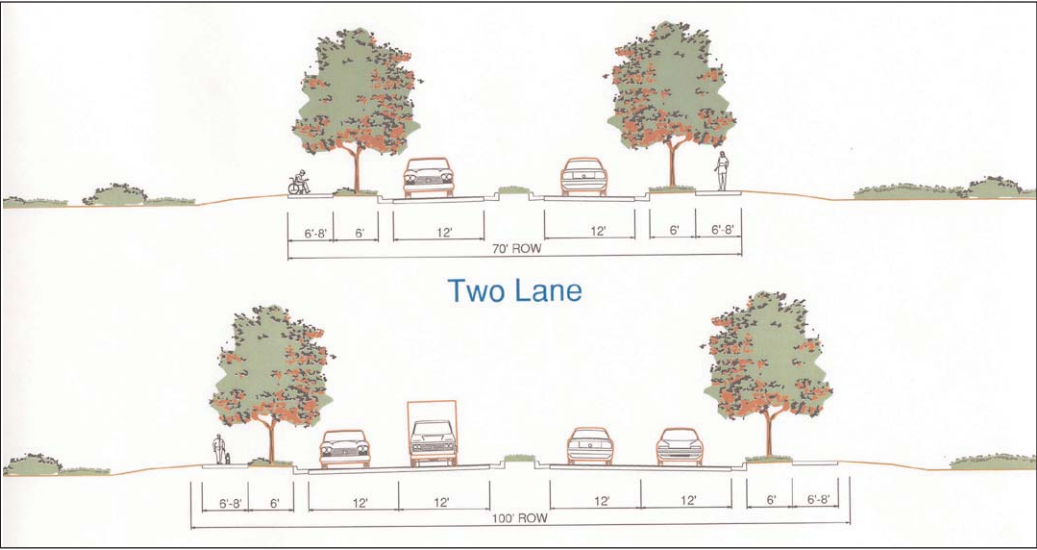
Typical Street Cross-Section - Highway/Special Purpose District
